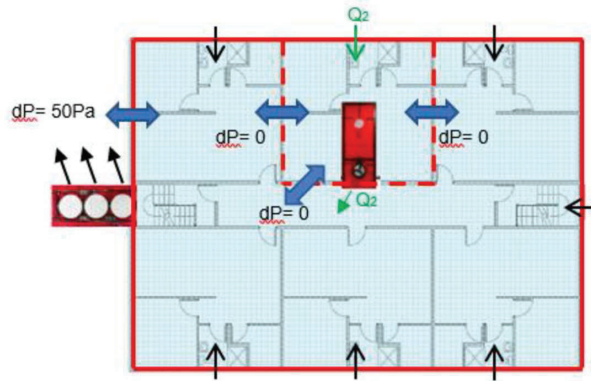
Single-unit exterior test for three units in a single-story garden-style building
